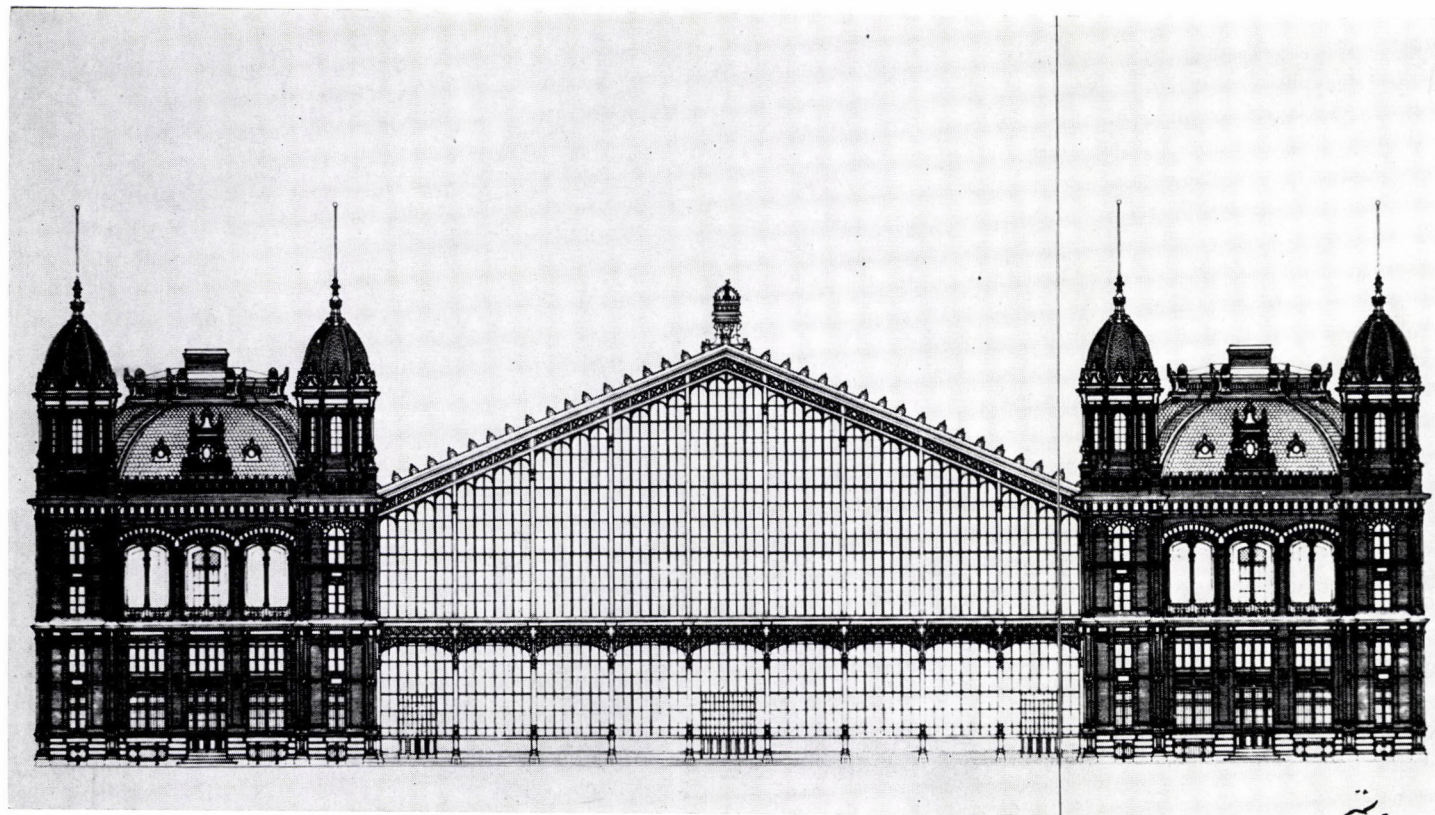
Front façade of the Western Station. Reconstruction plan, I. KATHY 1976
